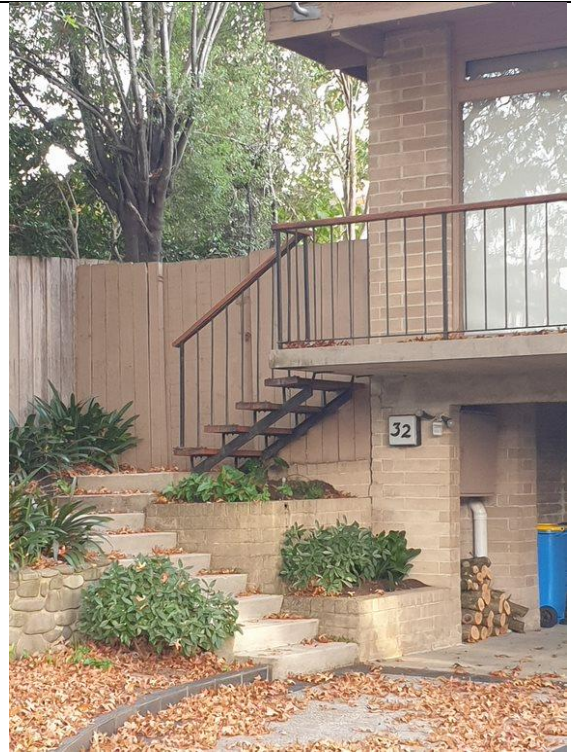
Details of entry steps and planters leading to the front deck with metal rod balustrade and unpainted timber handrail. Note the early light with No. 32. These steps are shown on the original garden layout. (Source: Context 2021)
